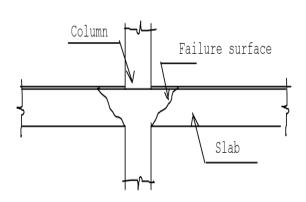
An illustration for Punching failure surfaces of tensioned flat slab.
